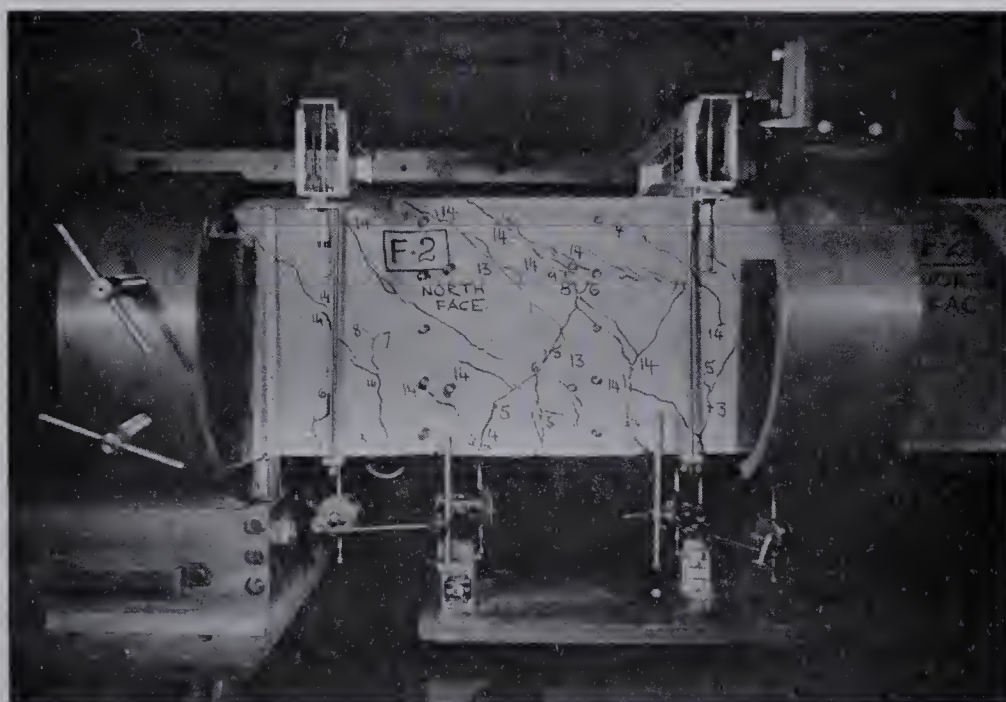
CRACK PATTERN FOR NORTH FACE OF BEAM F-2
